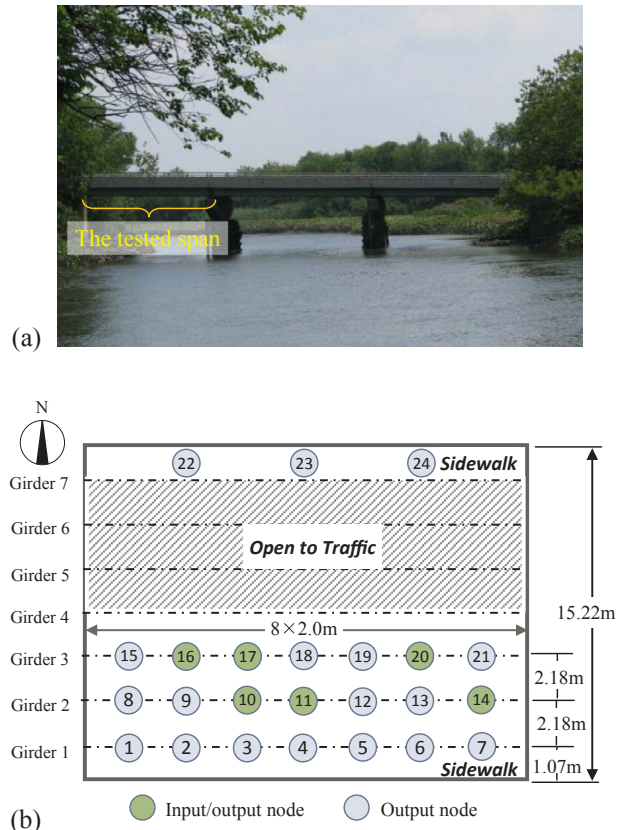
(a) Photograph of the bridge; (b) Layout of measuring nodes in the tested span.
